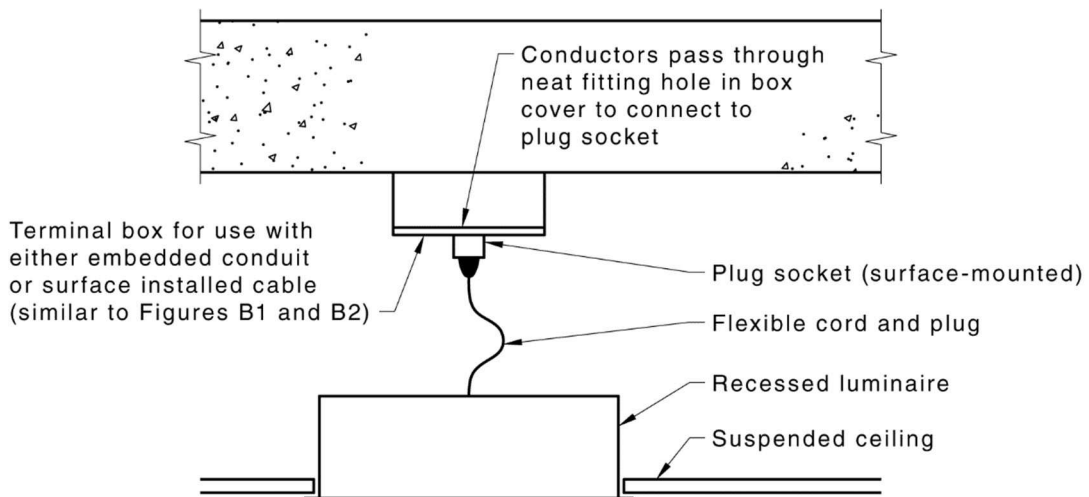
TYPICAL LAYOUT OF TERMINAL BOX AND RECESSED LUMINAIRE
